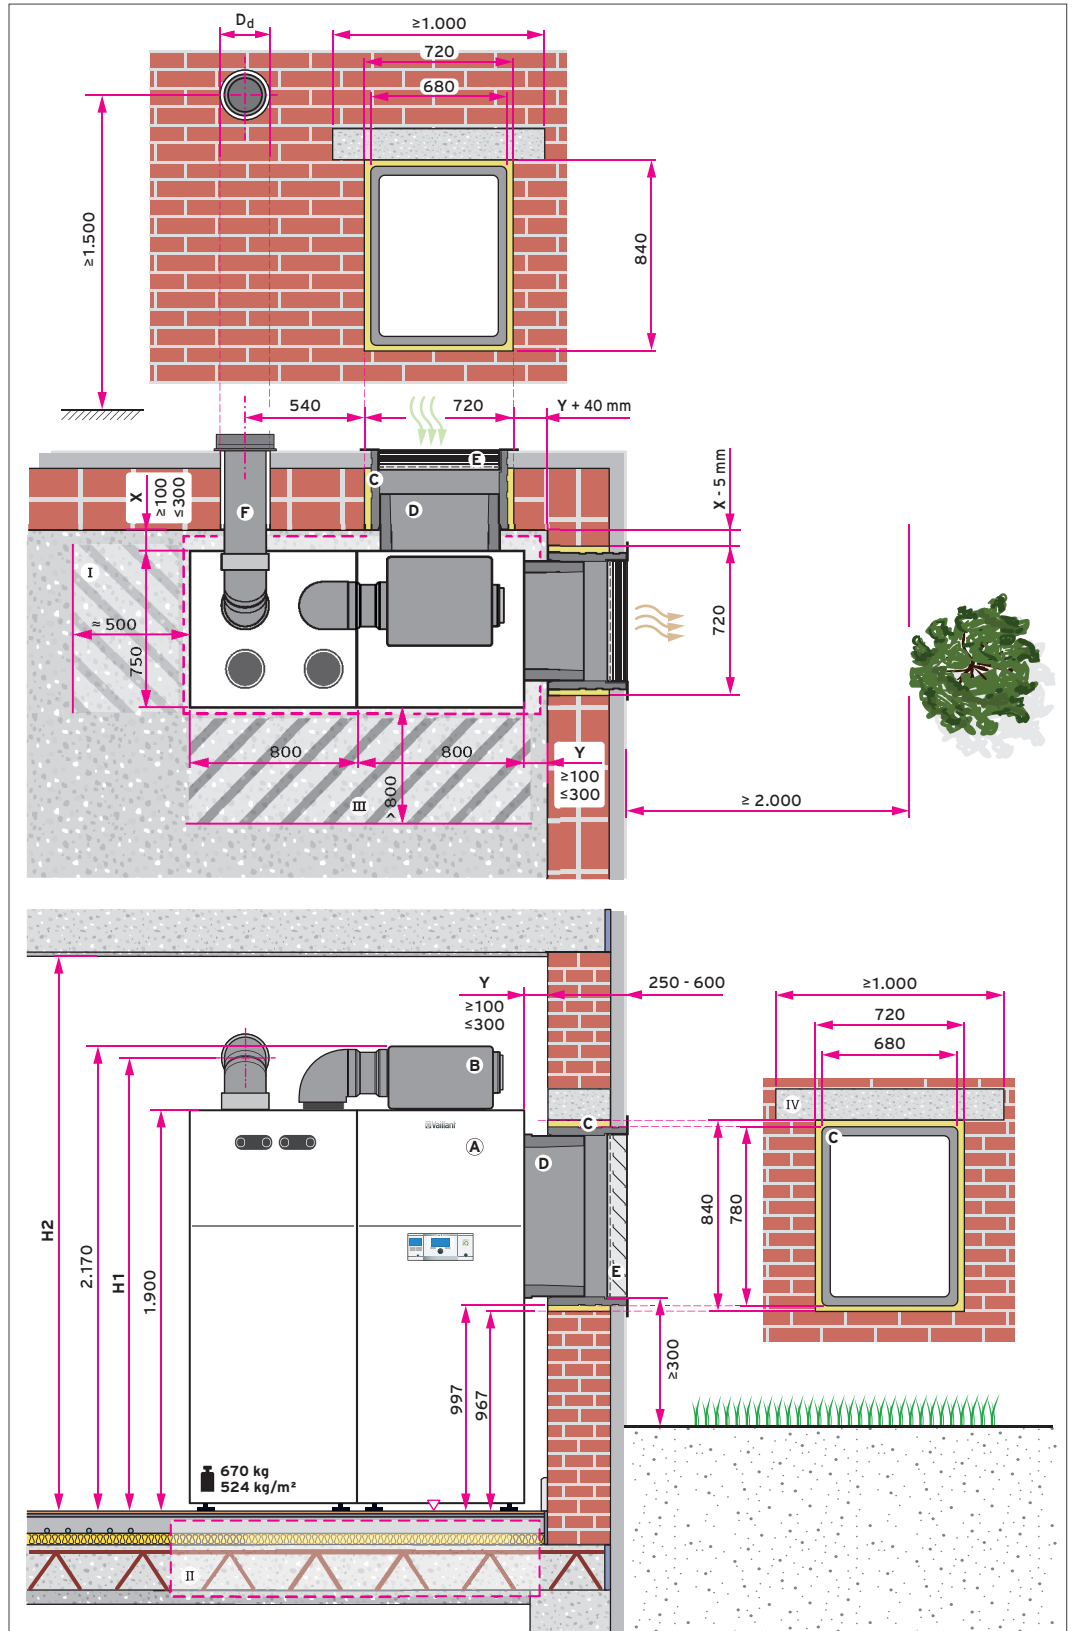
recoCOMPACT installation situation, ground floor - right-hand installation in the corner of a room
